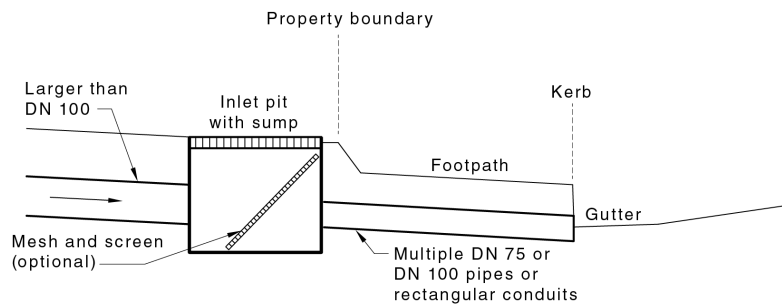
Typical arrangement of inlet pit and footpath crossing
